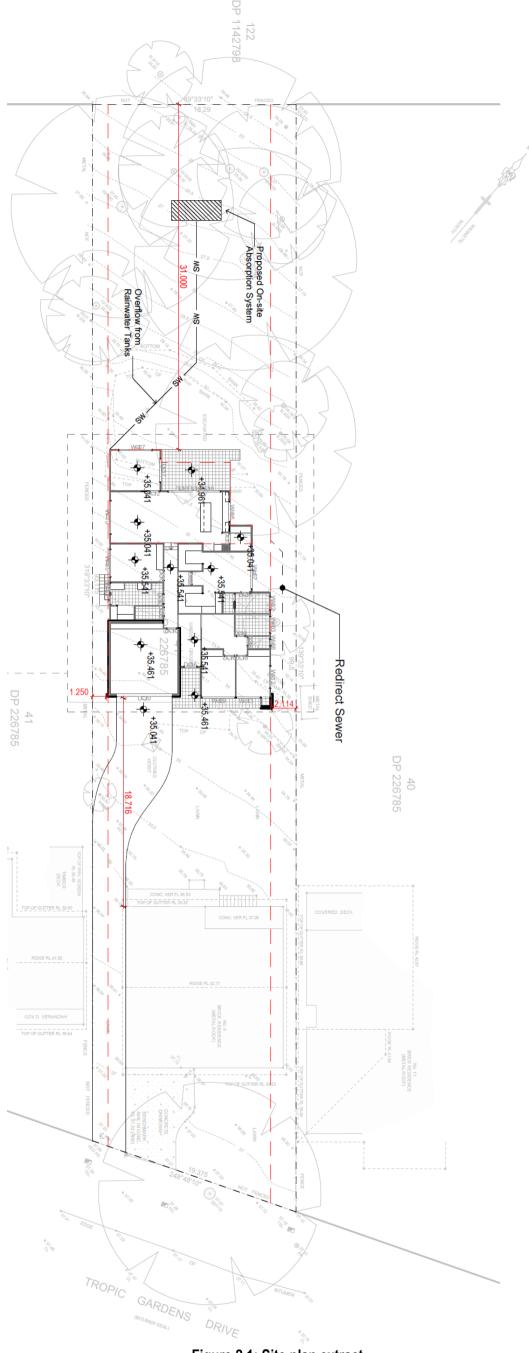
Site plan extract (Source: Joycon). Not to scale. North approx to top right of page.
